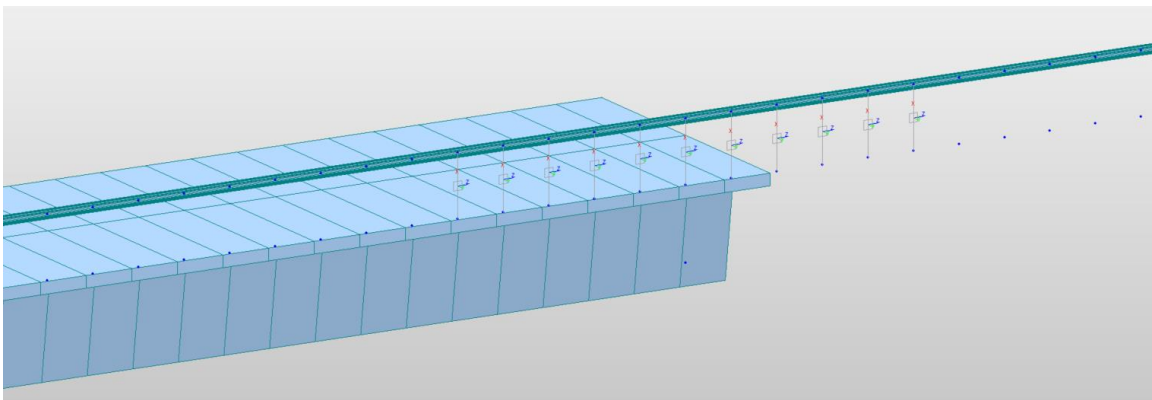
ZLR's installed at the Majuba Rail Bridge southern abutment
